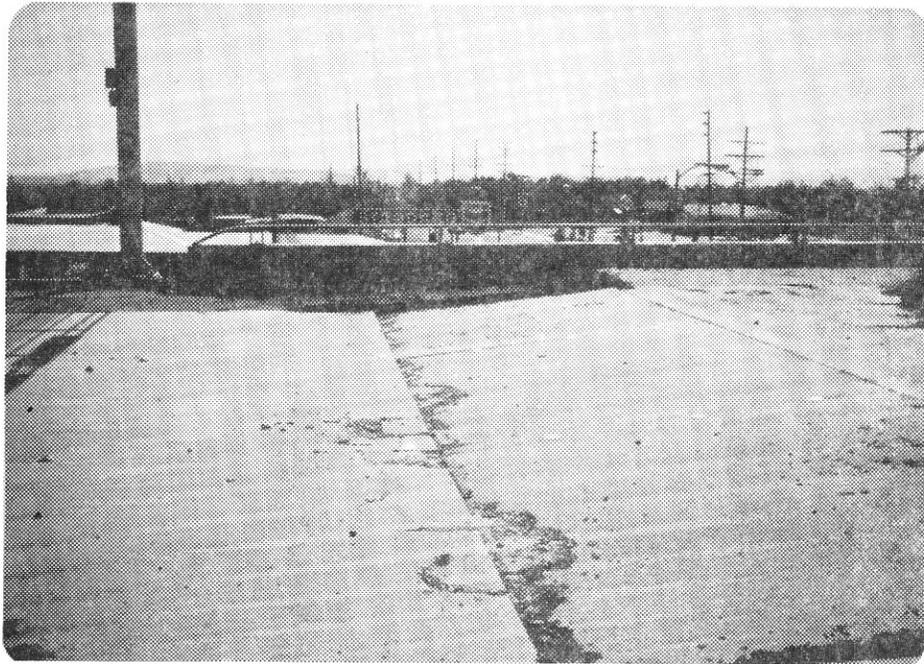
East approach of eastbound structure of Polk Street Undercrossing. Note approach slab spalling along transverse joint.
